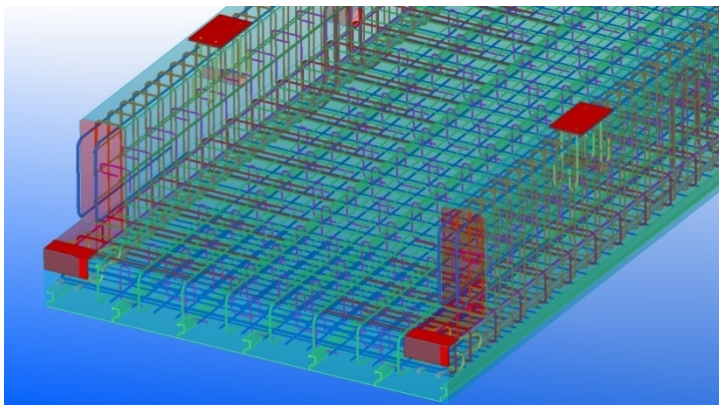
A typical U profile piece, showing corrugated metal sheet base, embed plates, reinforcement and lifting hooks.
